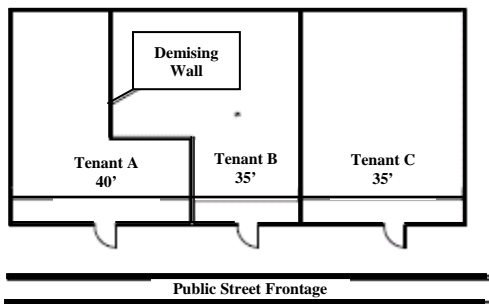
Horizontal multiple tenant building oriented towards street frontage – Tenant B would be permitted a 25 square foot sign, regardless of overall interior square footage of the tenant space.
